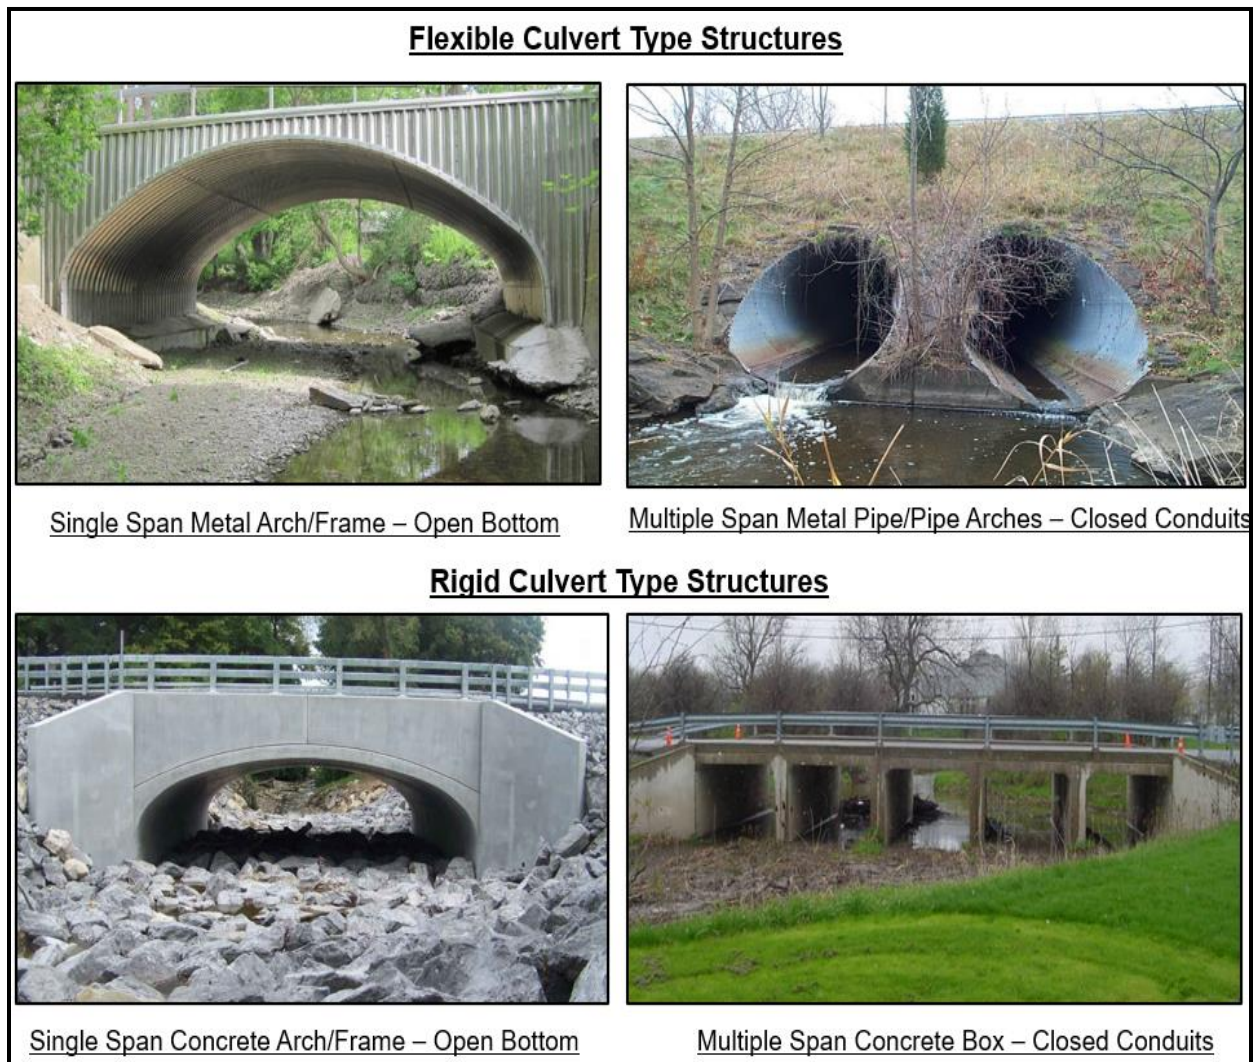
Examples of Rigid and Flexible Culvert Type Structures
